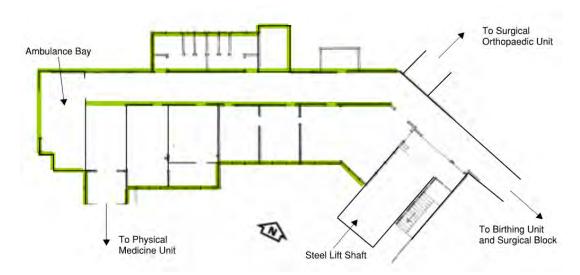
Maori Health Unit – Foundation Plan: Sub-floor walls
